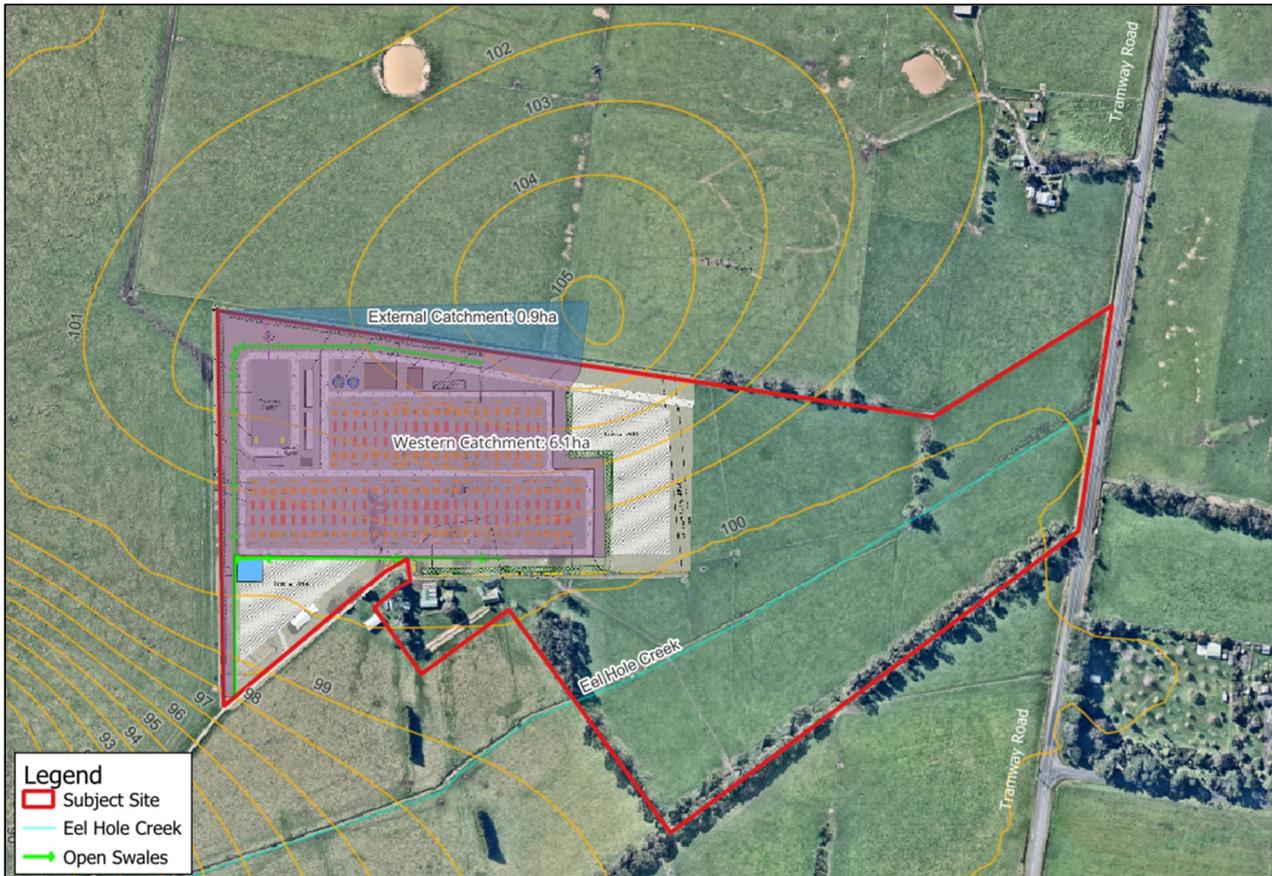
Proposed Stormwater Management Strategy Layout Plan
